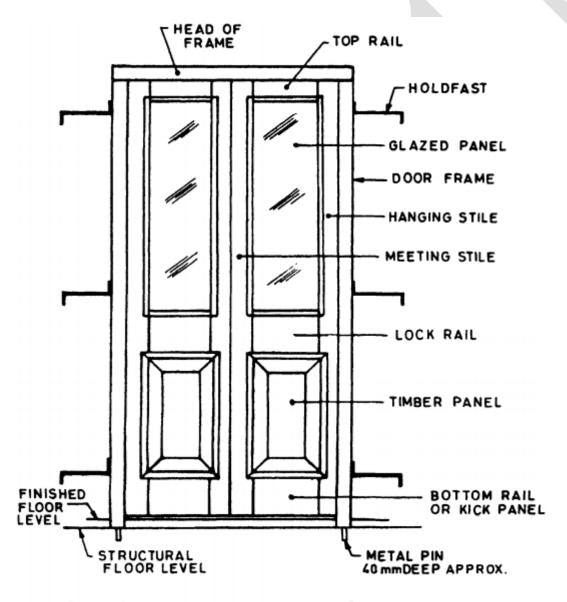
TYPICAL ILLUSTRATION OF DOUBLE PANELLED DOOR WITH TIMBER AND GLAZED PANELS
